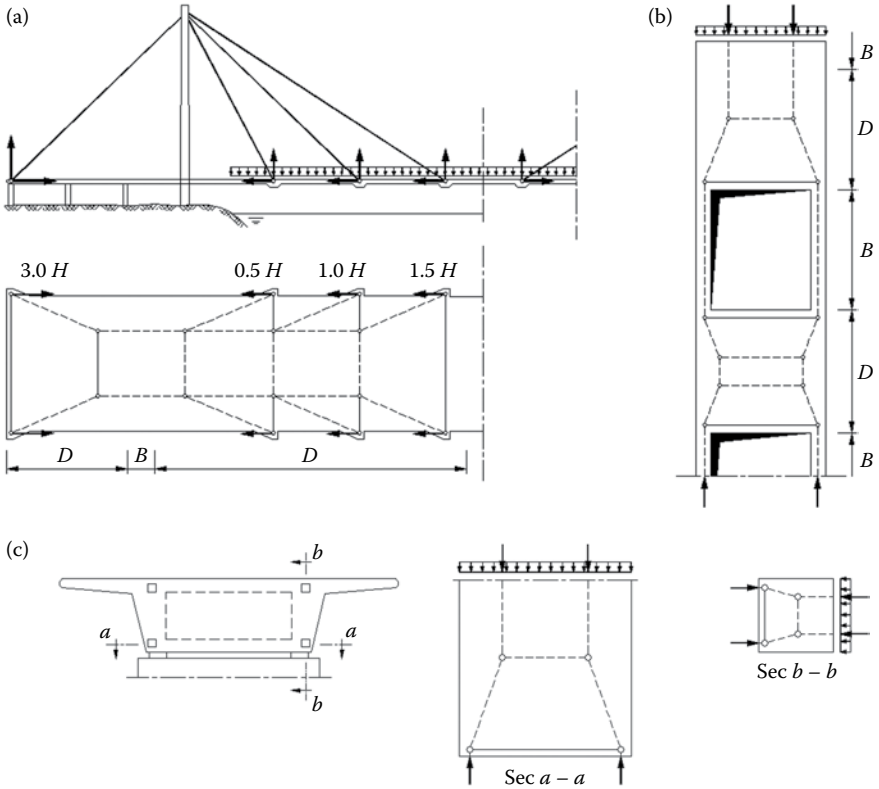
Three examples for the application of the model of the deep beam of Figure 2.3 (Schäfer and Schlaich, 1998): (a) anchorage of stay cables in a bridge deck, (b) wall with a large opening, and (c) anchorage of tendons in a box girder bridge.
